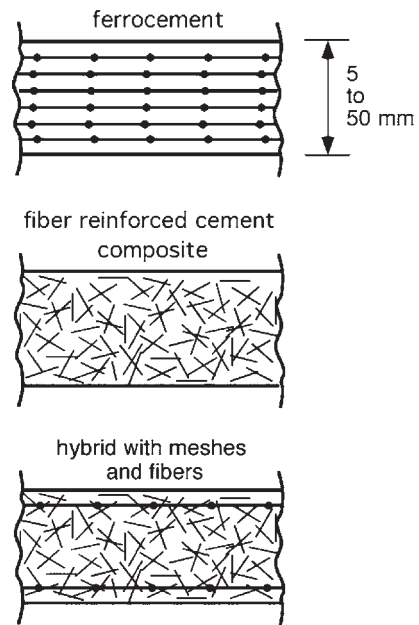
Typical sections of ferrocement and thin-sheet reinforced concrete products.
